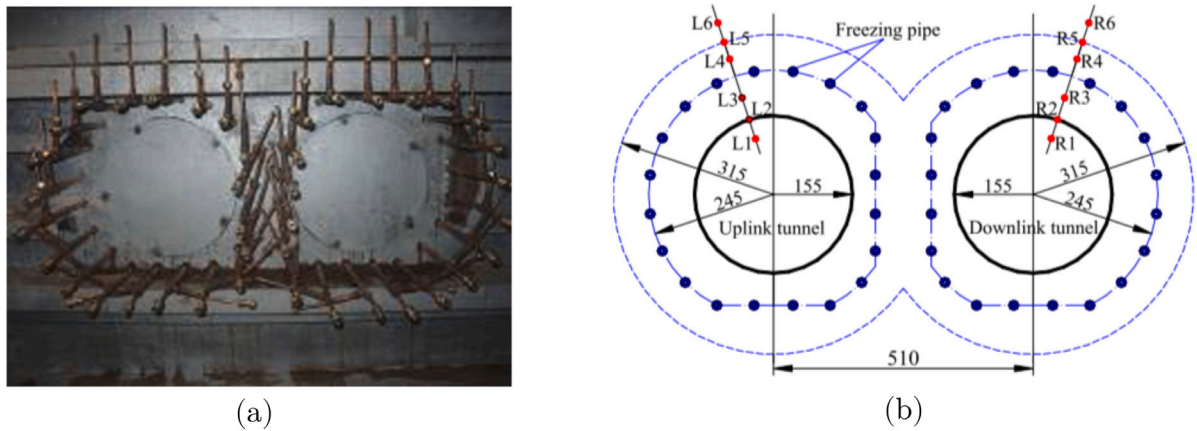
Model test system for the sequential freezing and excavation of twin tunnels from Cai et al. (2019). (a) Freezing pipe arrangement. (b) Layout of freezing pipes and temperature measuring points (unit: mm).
